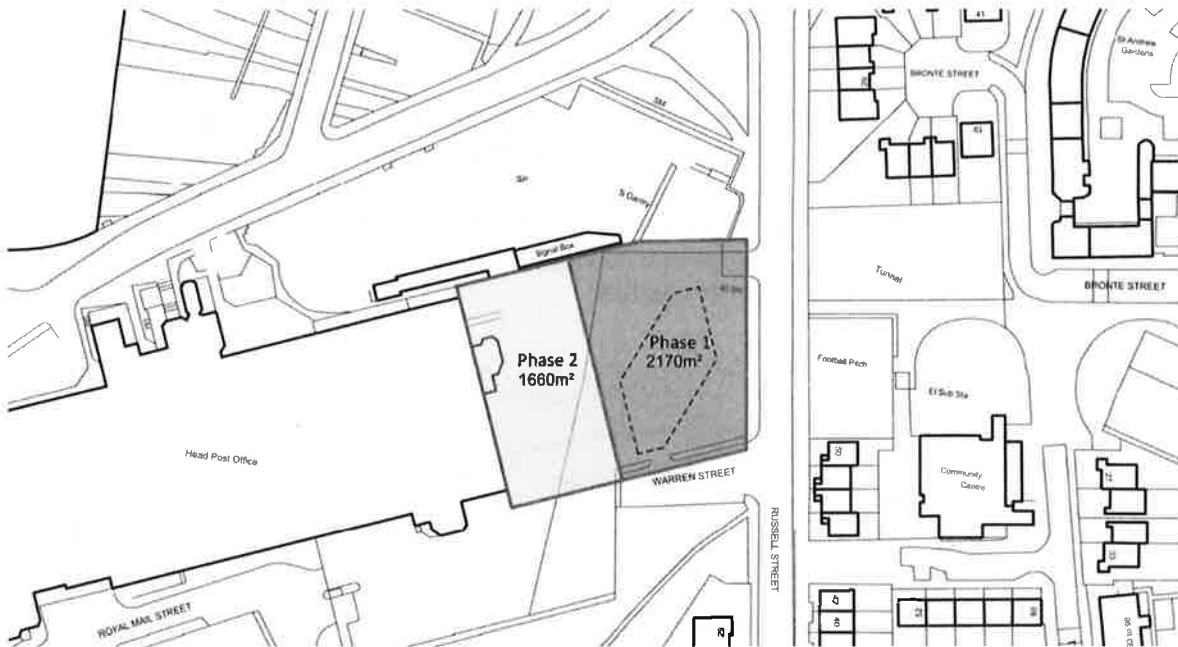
Site plan showing the location of the proposed Sensor City building (magenta, "Phase 1") with road access to Russell Street and the provision for future expansion (orange, "Phase 2").
